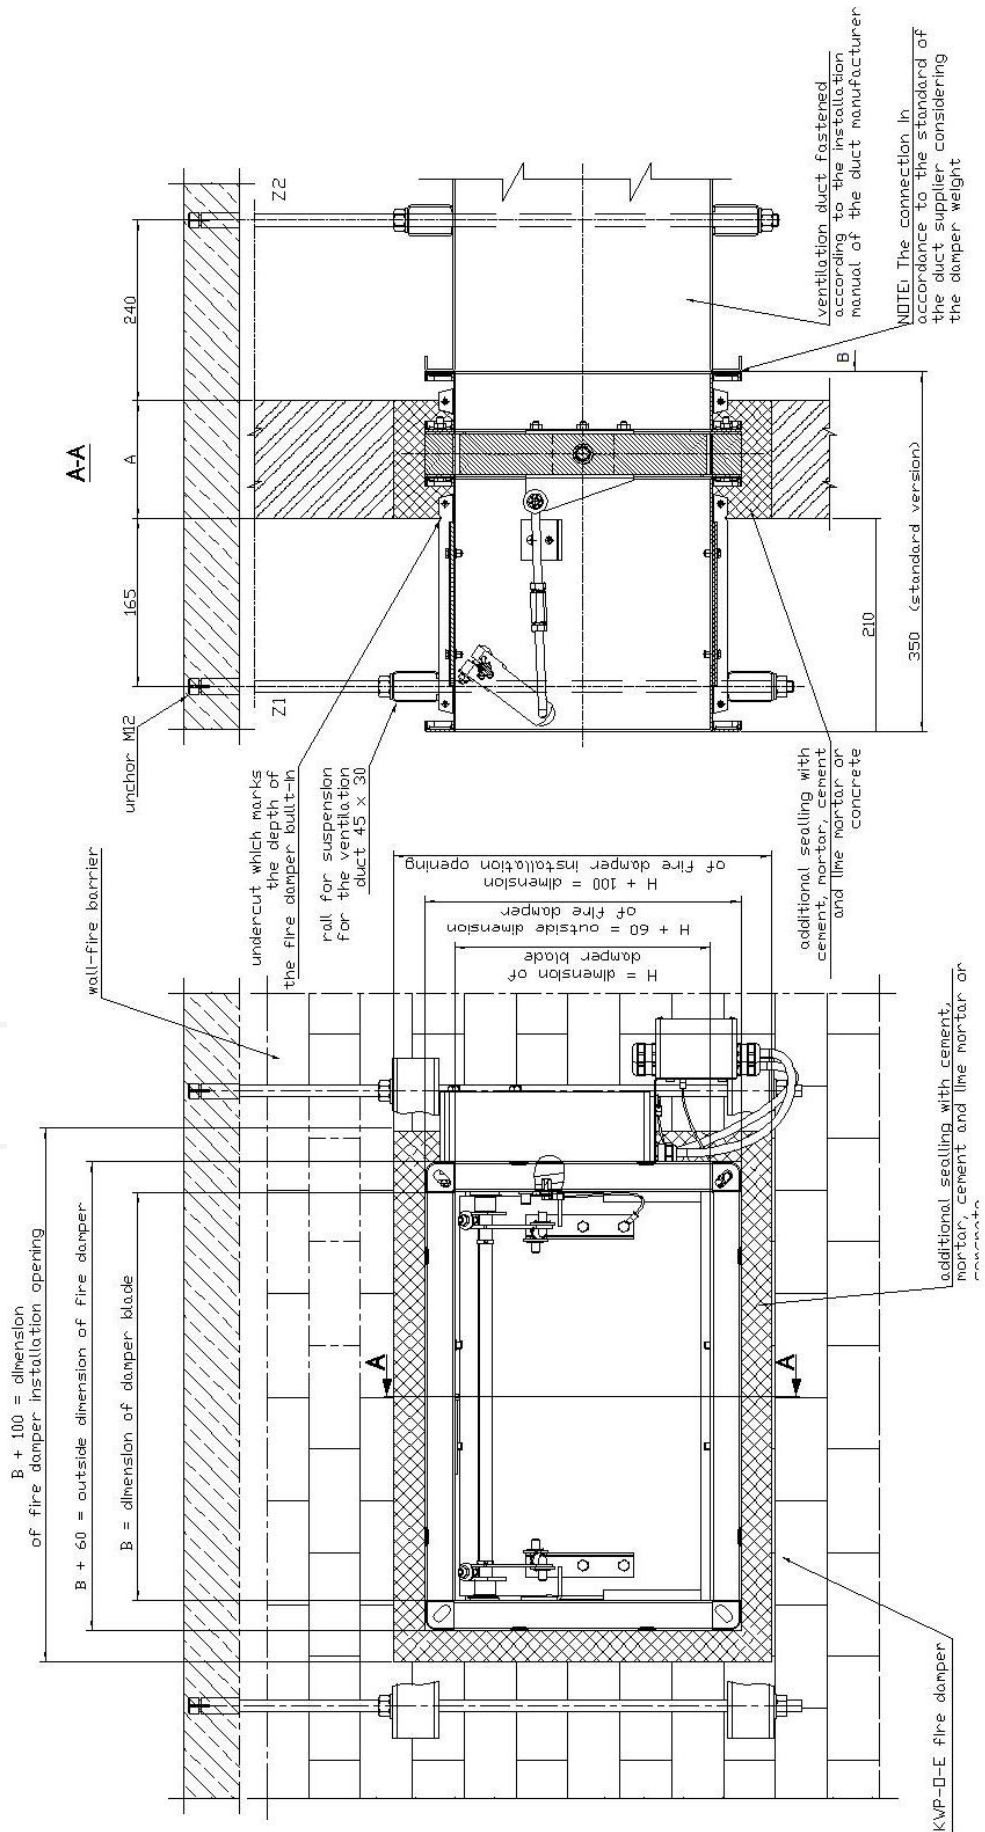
Installation method of fire dampers KWP-O in rigid wall
